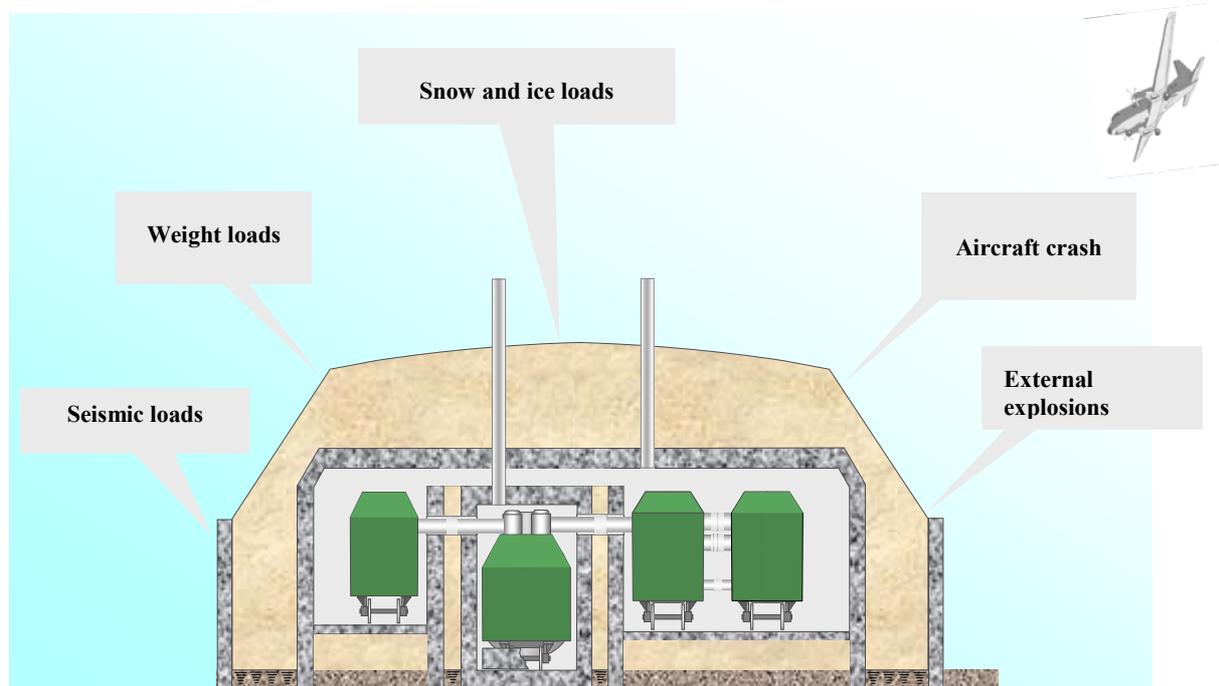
Lateral section of the BN GT-300 shelter building.
